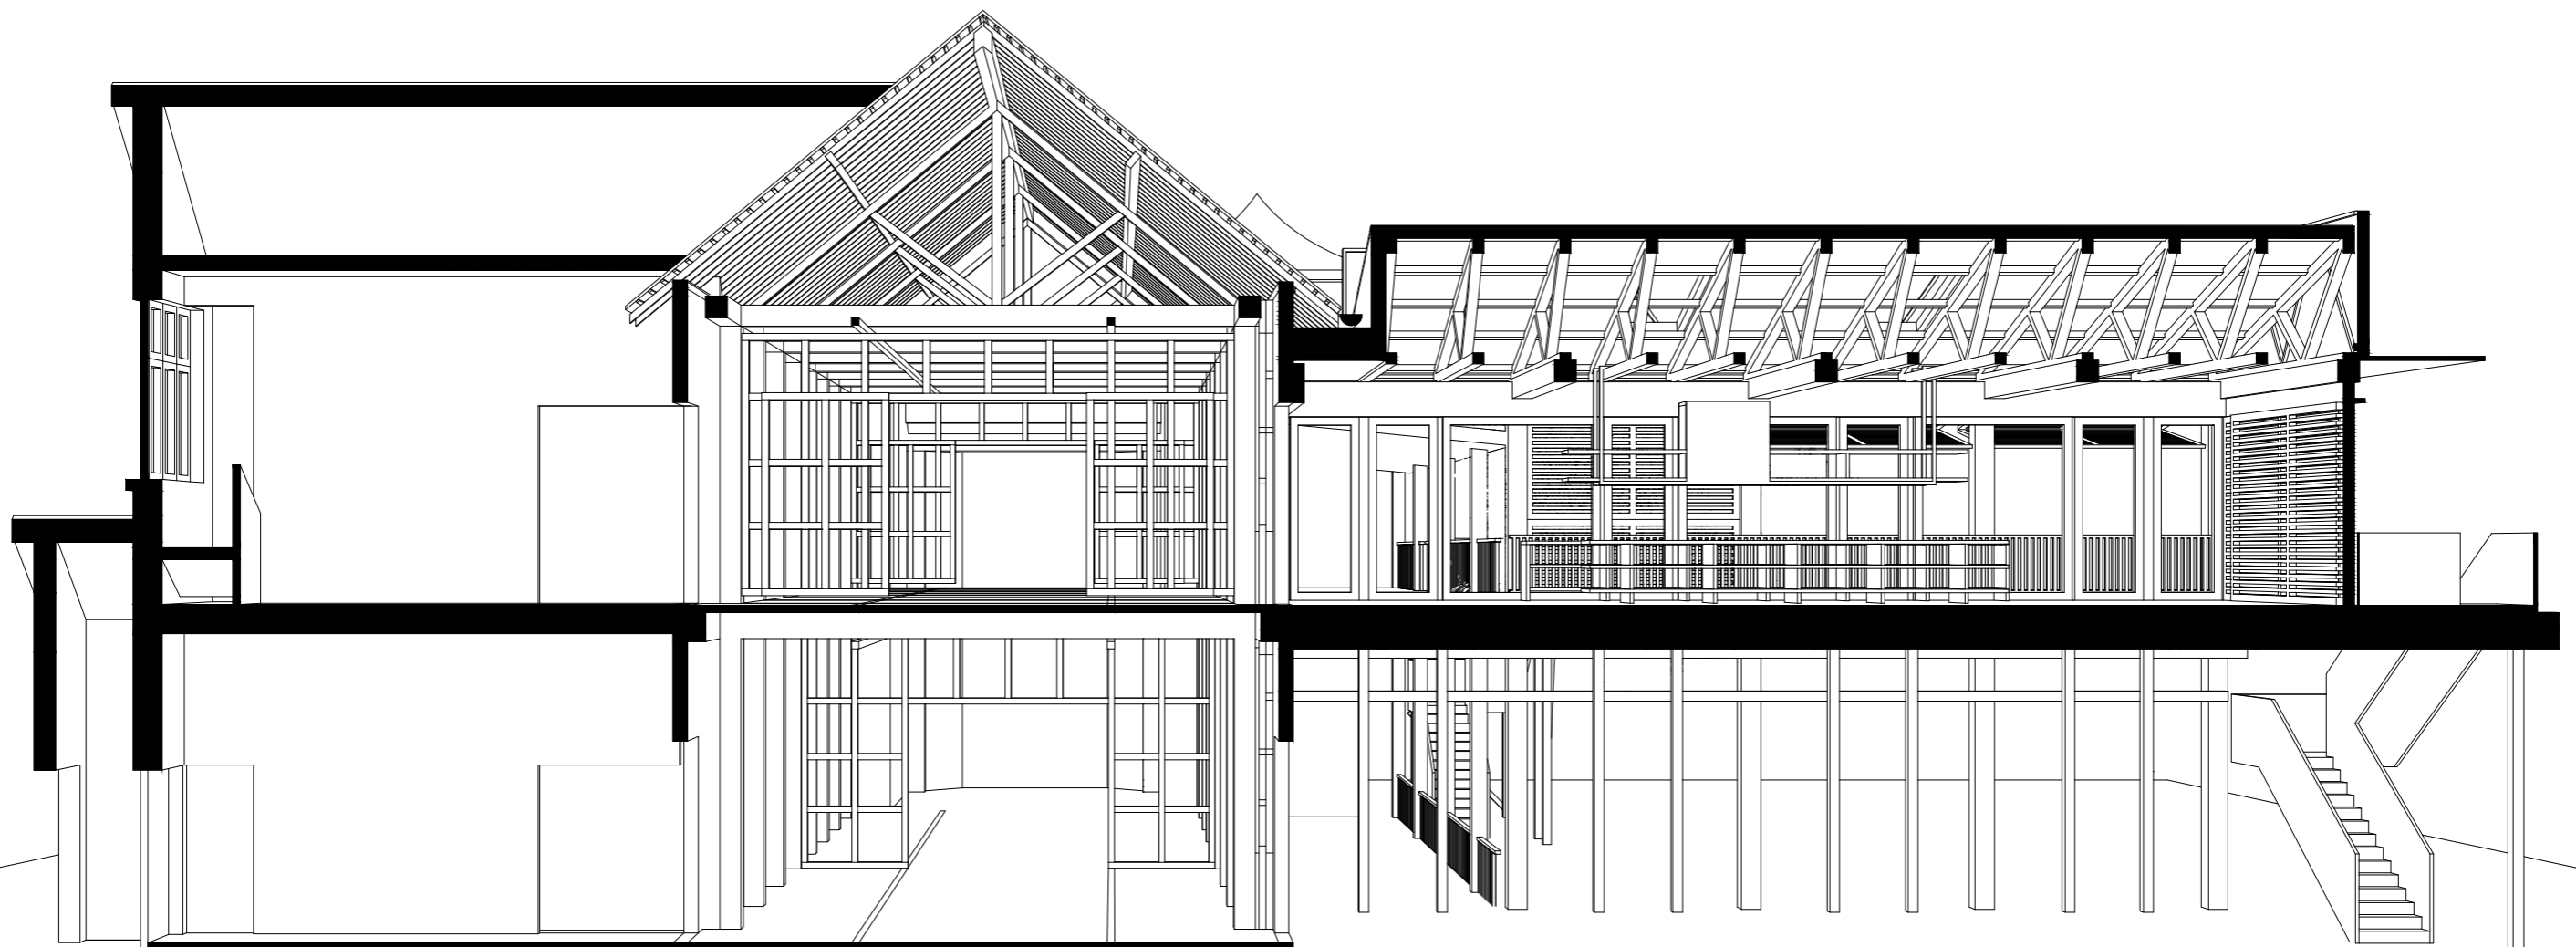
Perspective section B-B through the primary entrance, main building and revised East Wing family room and courtyard.
